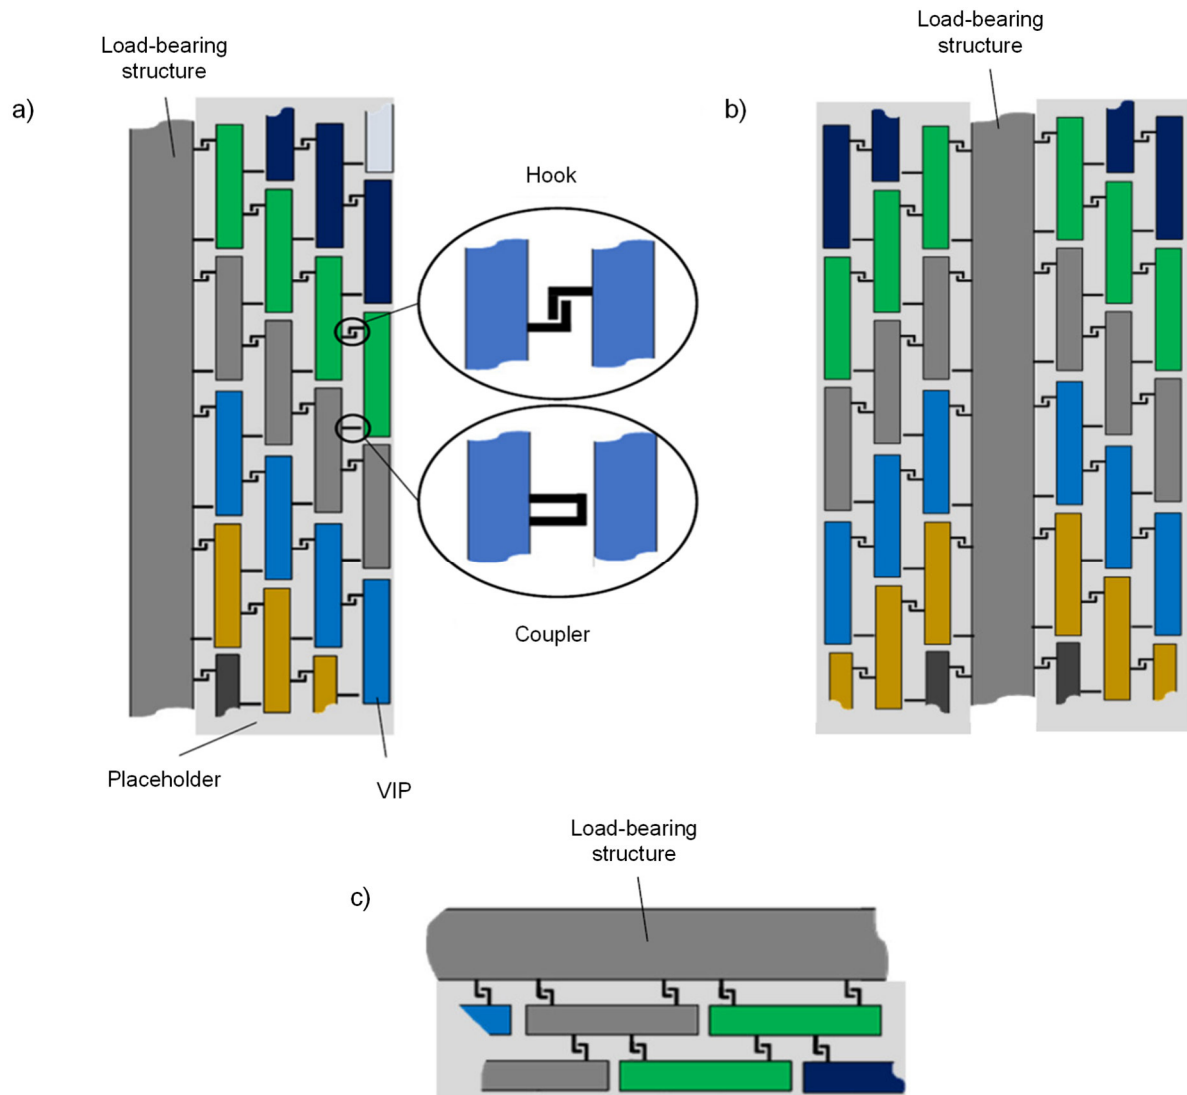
Suspended VIPs with hooks and spacers. a) Inner insulation layer anchored to the inner tank wall. b) Separation wall bearing inner and outer insulation layers. c) Outer roof bearing the insulation system
